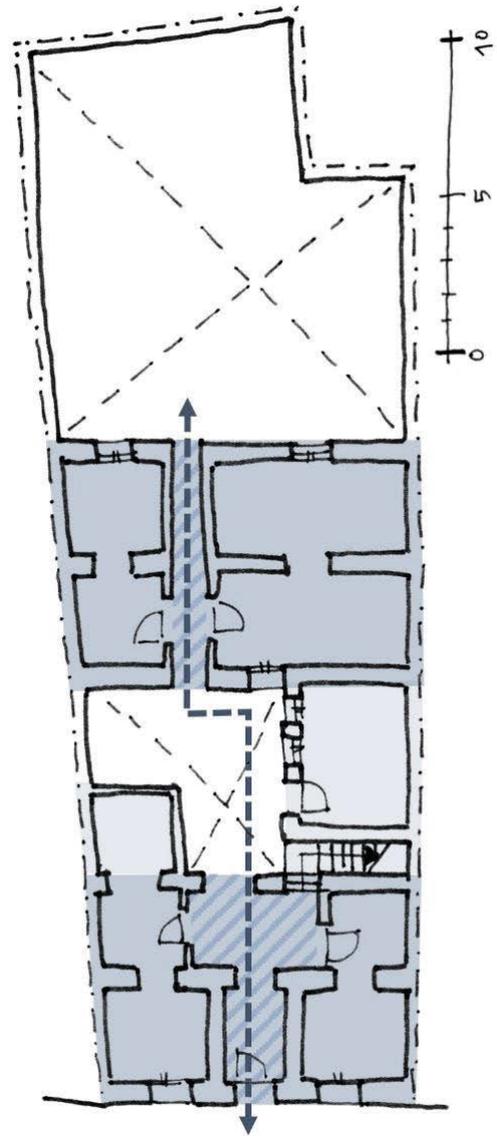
Groundfloor plan. House in Utrera (Source: PEPCH Utrera 2018).
